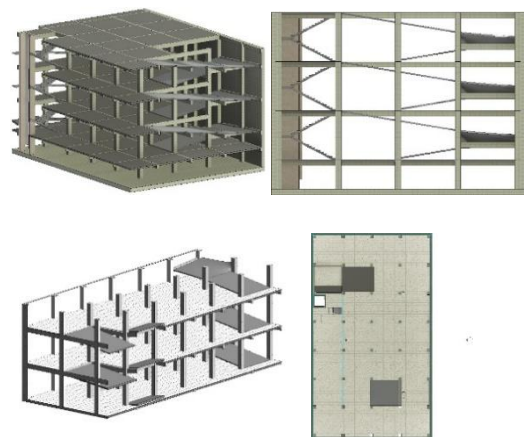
Pre-construction stage 3d view, sectional view and plan view using BIM
